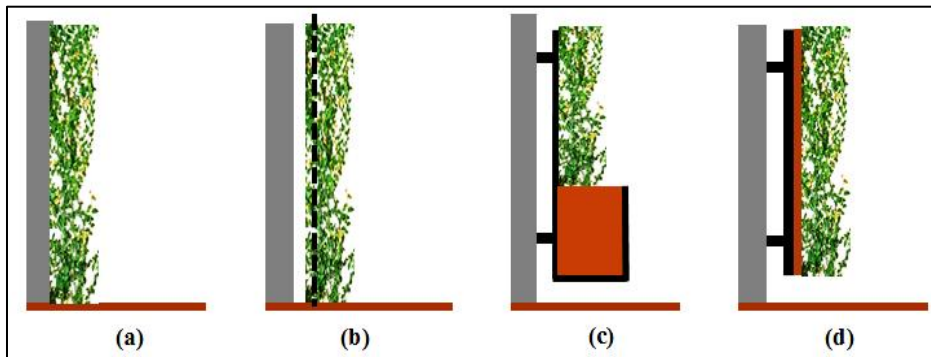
(a) Direct green facade; (b) Indirect green facade; (c) Indirect green facade with planter box; (d) Green living wall
